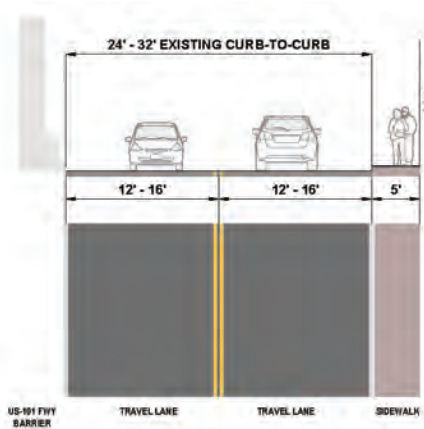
East Bayshore Road Existing Typical Section From Menalto Avenue To Bay Road (Facing West)
